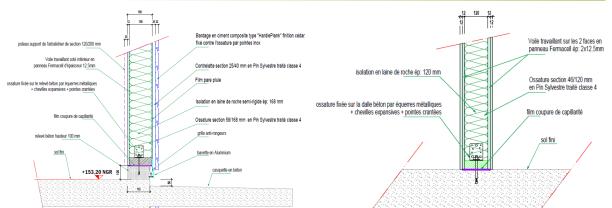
section of the exterior wall of the first floor of the primary school. © Antoine Perrau Architecture.
